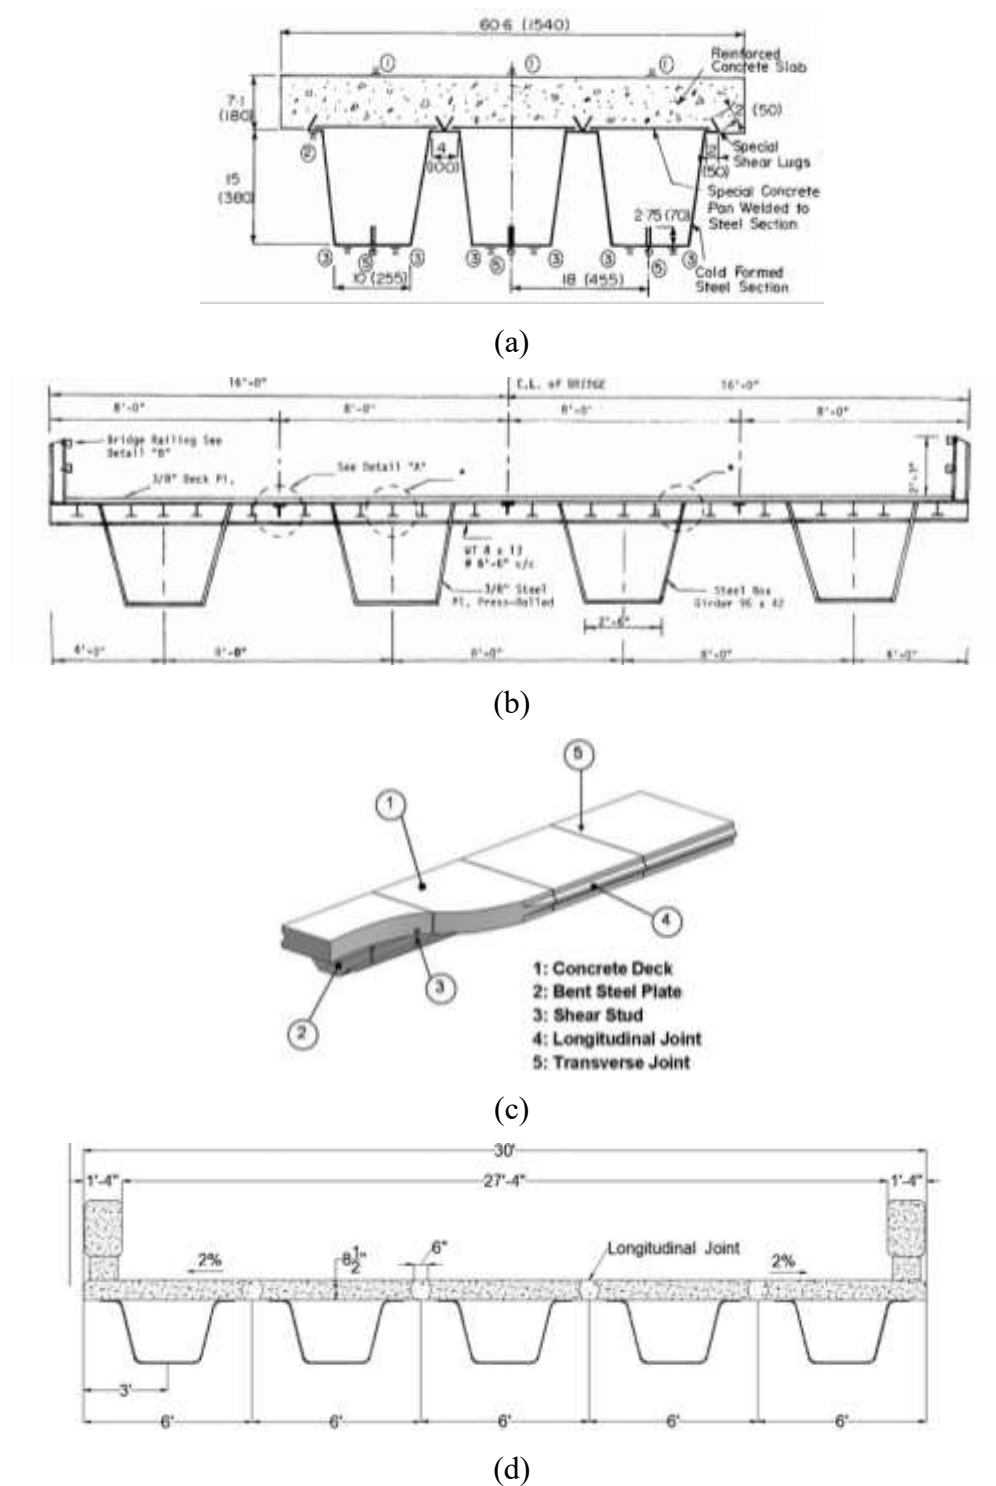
(a) Composite bridge proposed by Kenndy and Madugul (1978) [9], (b) Taly and Gangarao innovated Bridge System (1979) [10], (c) Composite Steel Box Girder Burgueño (2008) [11], (d) folded plate girders Deng et al. (2016) [4]
